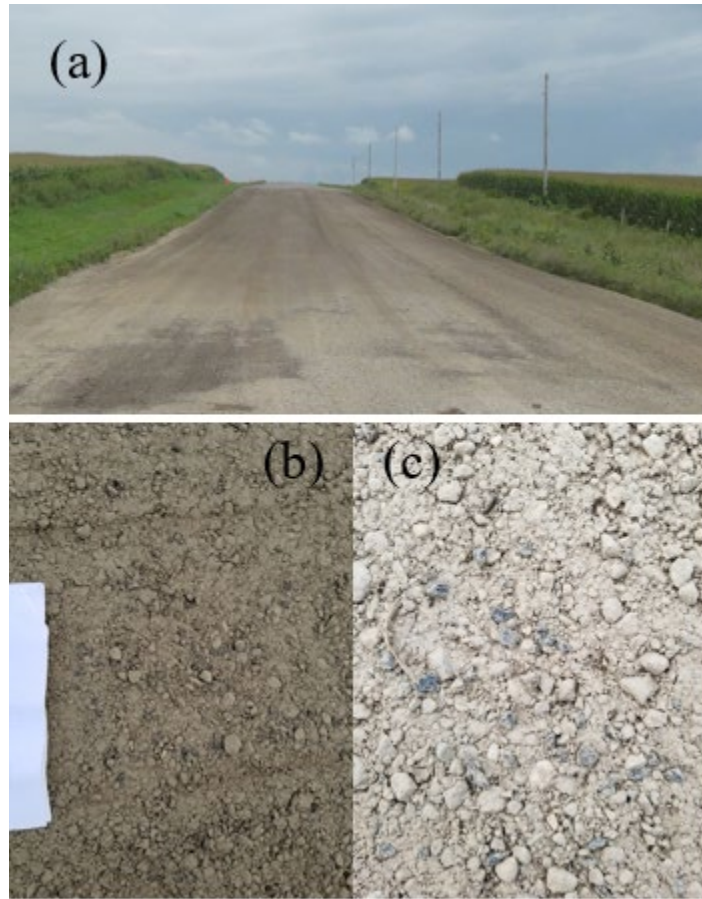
Ground tire rubber section at end of construction: (a) test section in Howard County and (b and c) Howard test section surface
